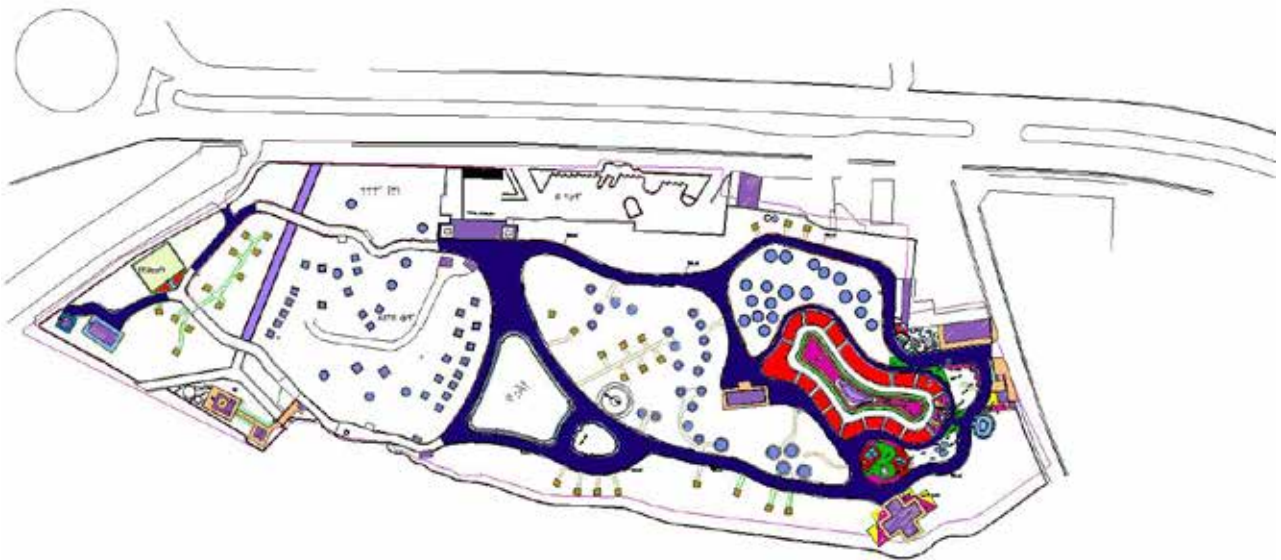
Molla Khalila garden plan. Source: www.fazayesabz.qazvin.ir.
